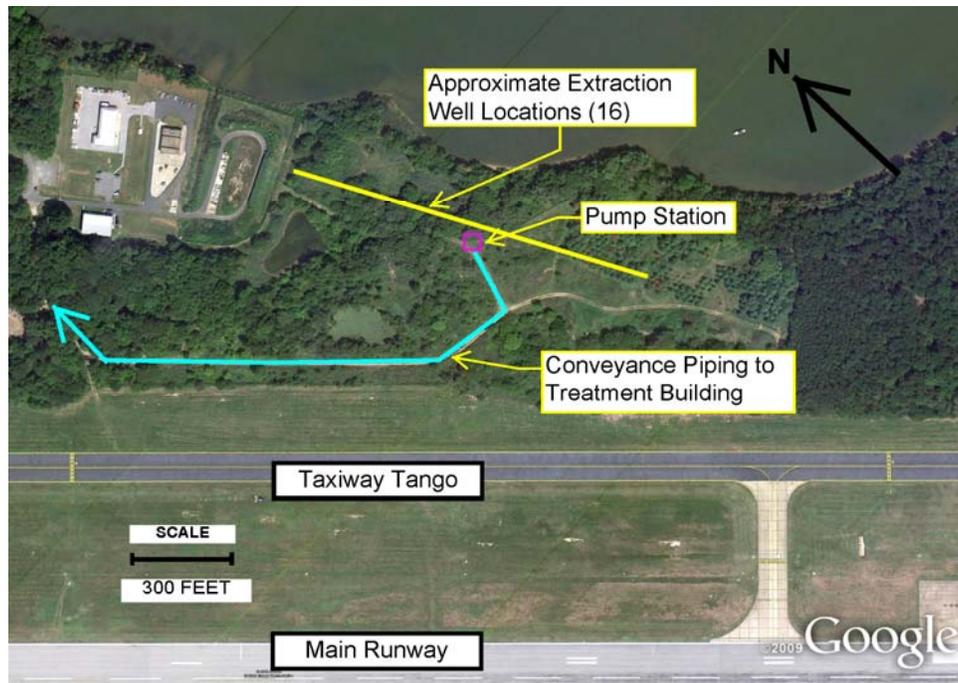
CURRENT 30% DESIGN PUMP STATION AND PIPING LAYOUT (TREATMENT BUILDING AT AN OFF-AIRPORT LOCATION)
